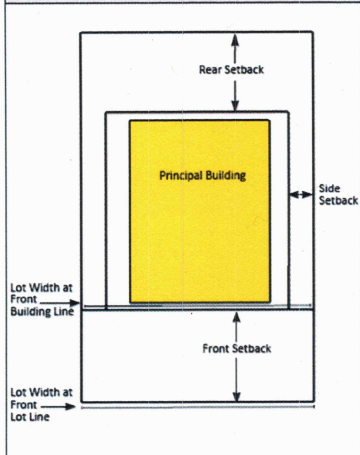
RESIDENTIAL ZONE FACT SHEET
